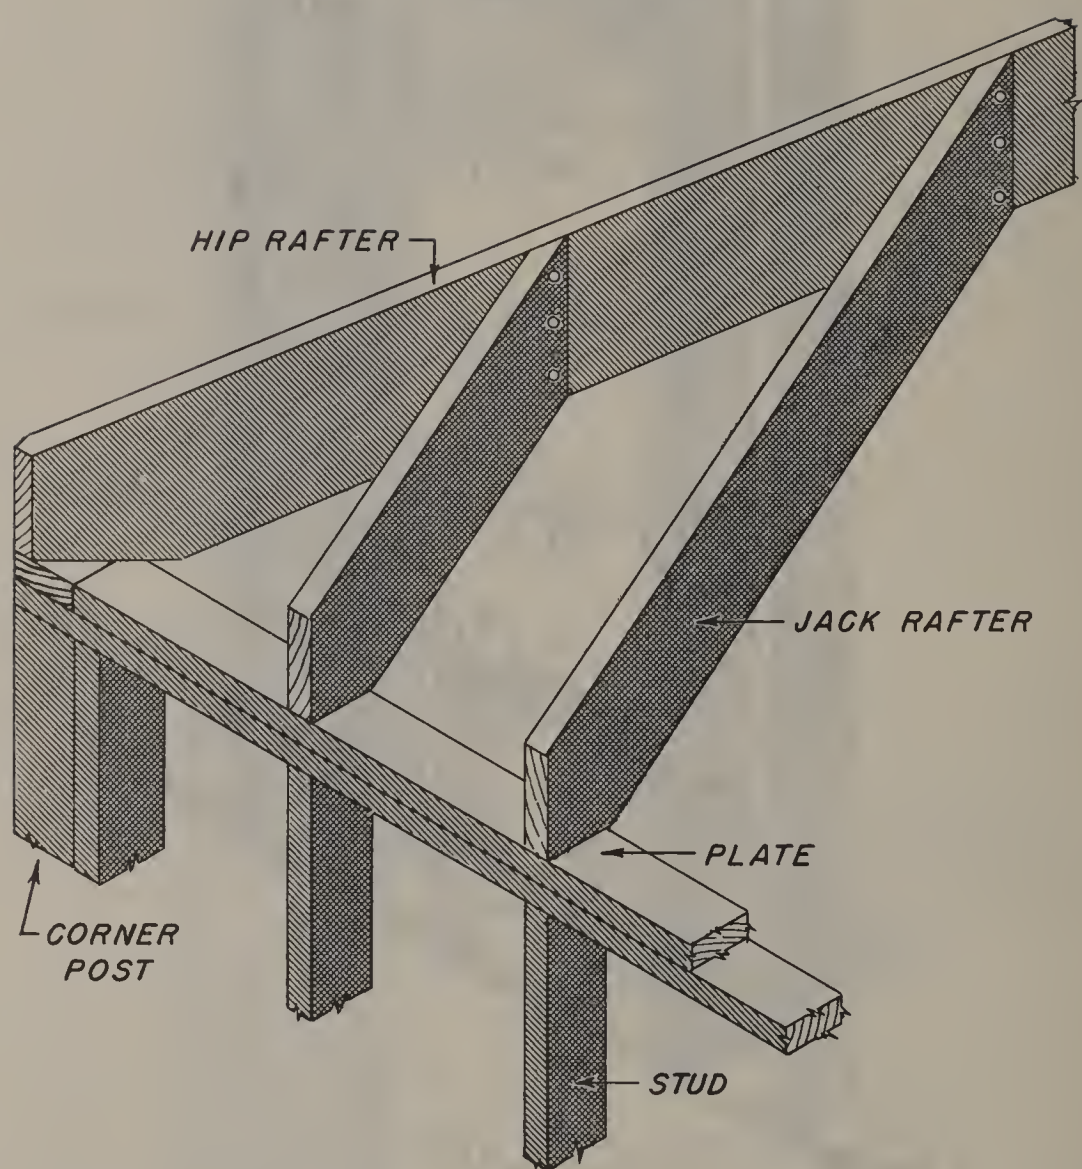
Jack rafter. Jack rafter toenailed to hip rafter with three tenpenny nails.
